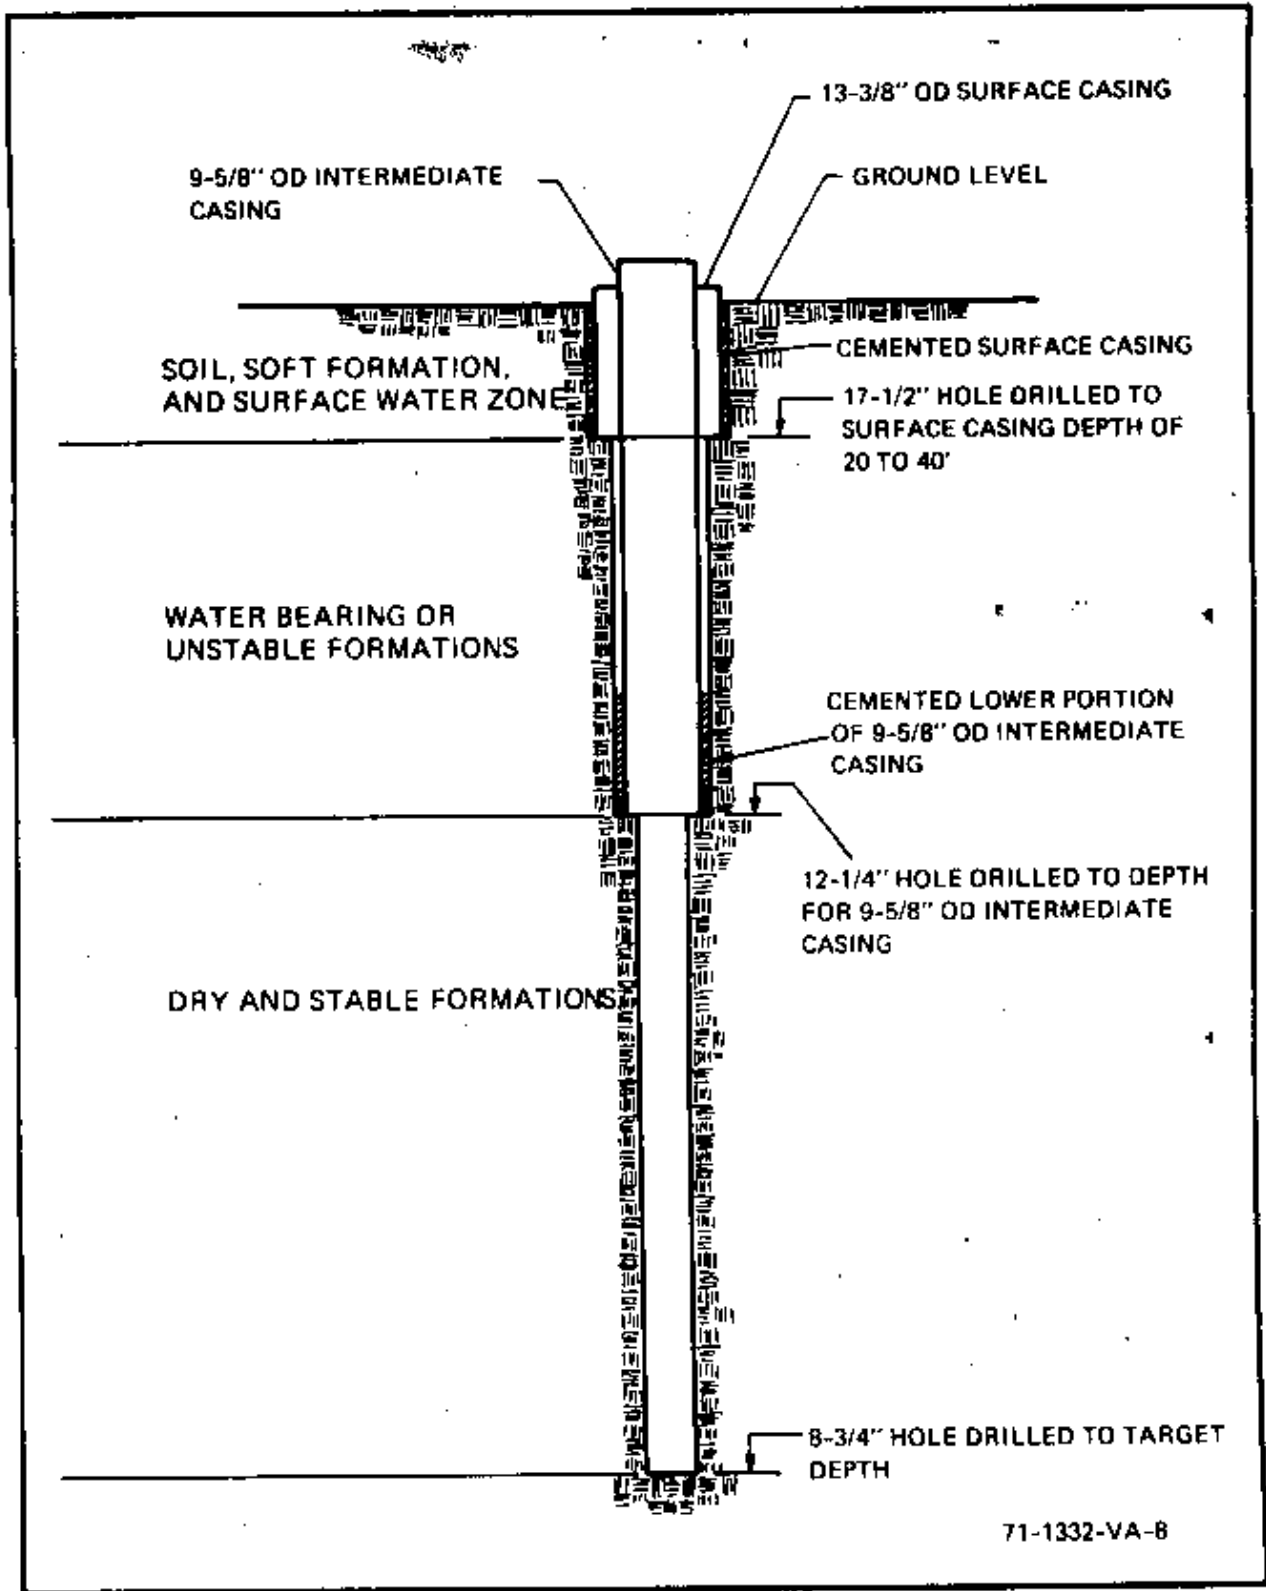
Hole Diameter and Casing Program for the Probe Hole Drilling Through Water-Bearing or Unstable Formations
